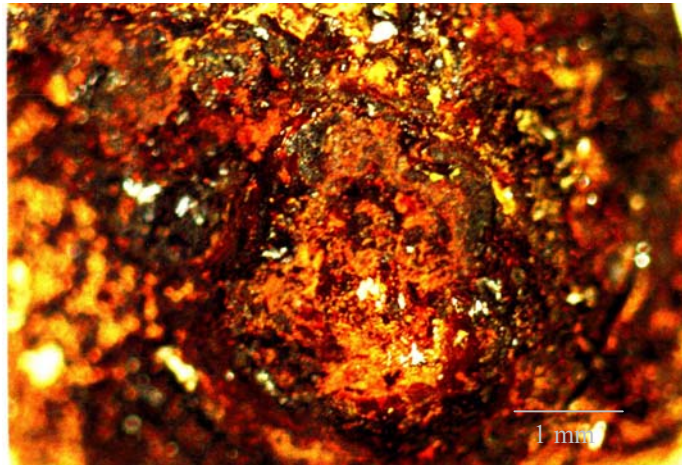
Photograph of coating cracks on Left Bar of Specimens 17.
